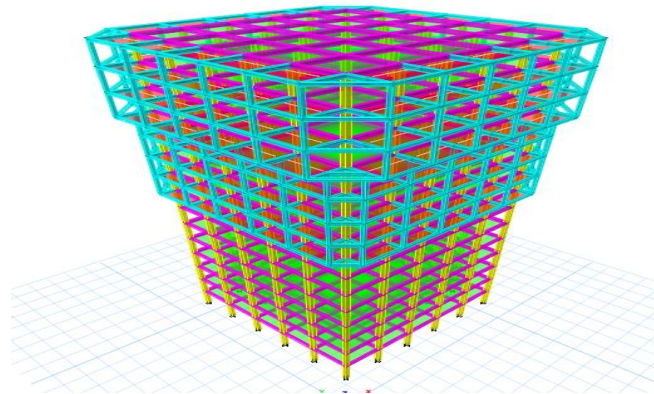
3D- Render view with Cantilevered offset - Type F Model
